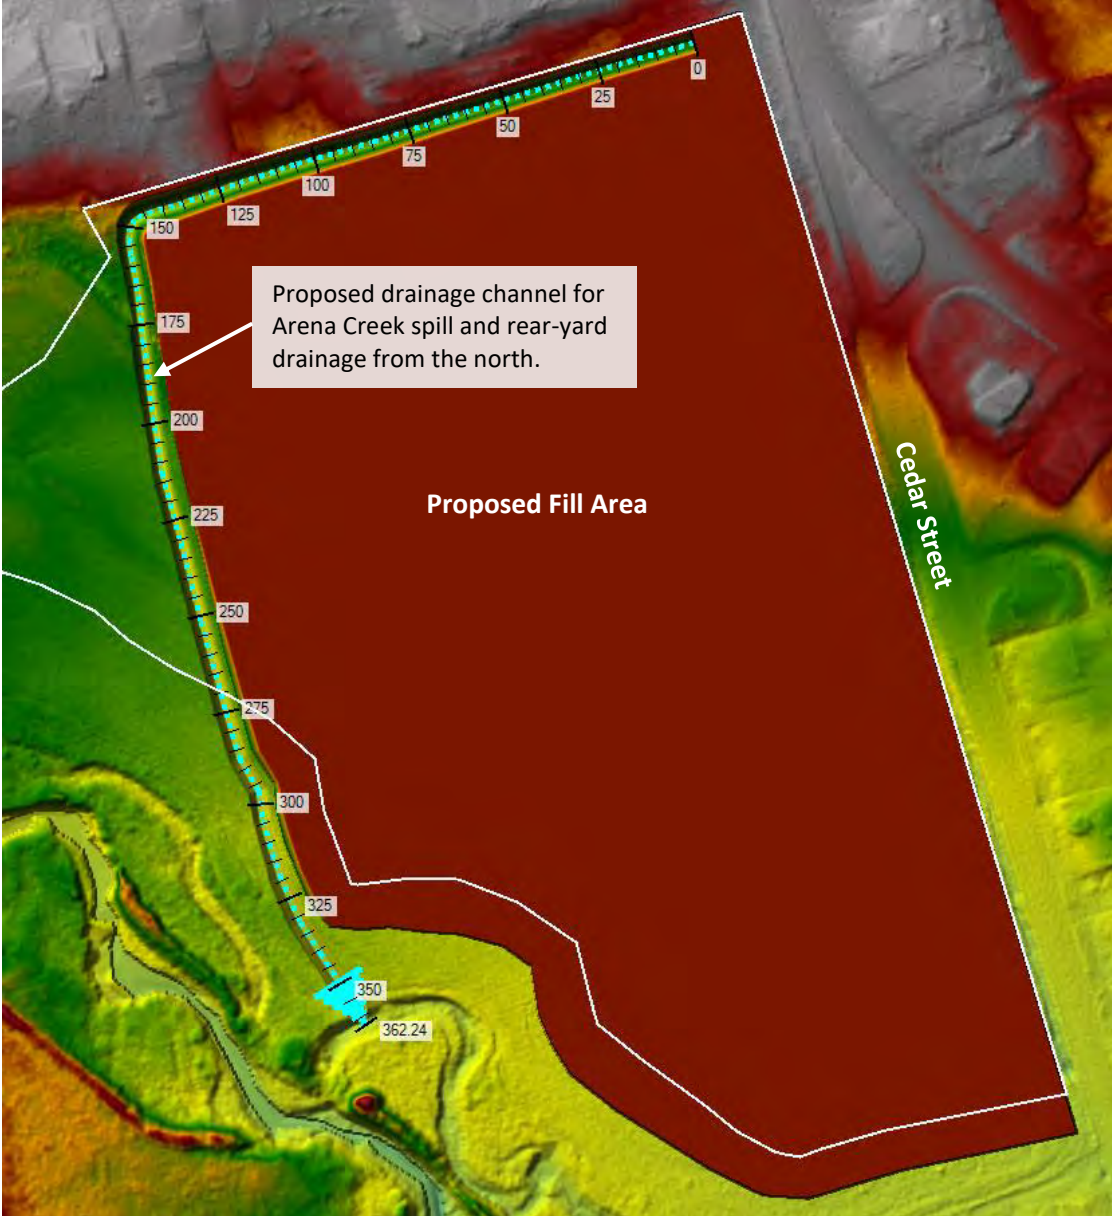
Arena Creek Spill Drainage Channel Along Perimeter of Proposed Dry-Floodproofed Lands
